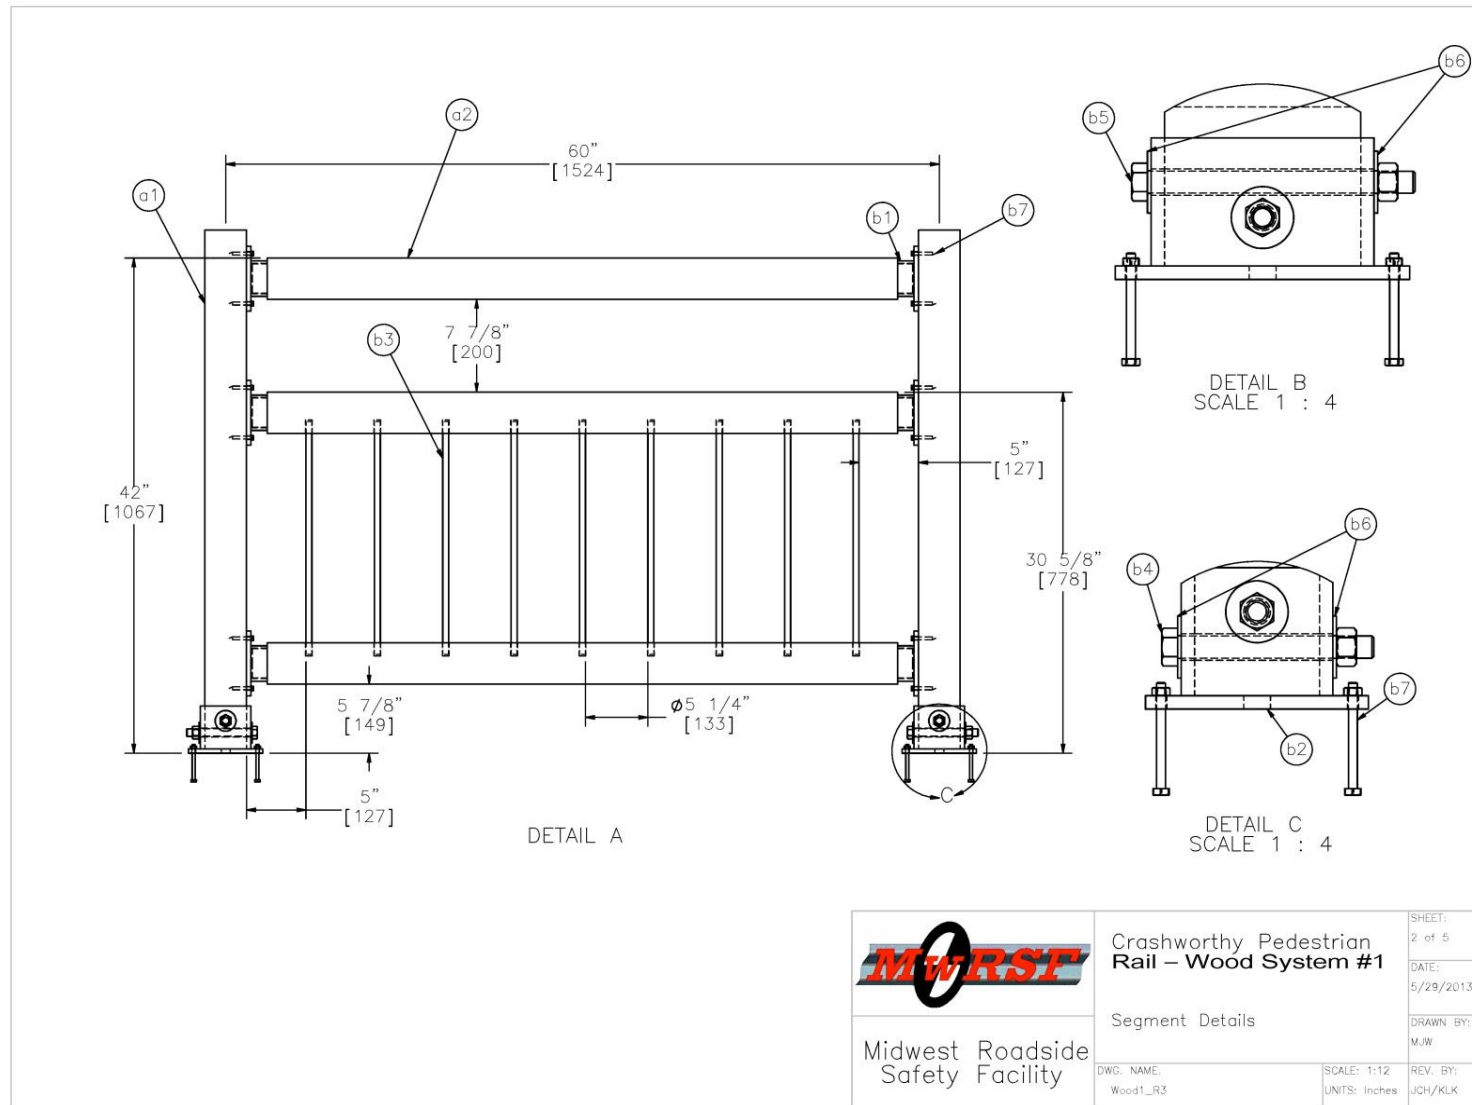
Modular Wood Rail, Design Concept WOOD1 (Sheet 2 of 5)
